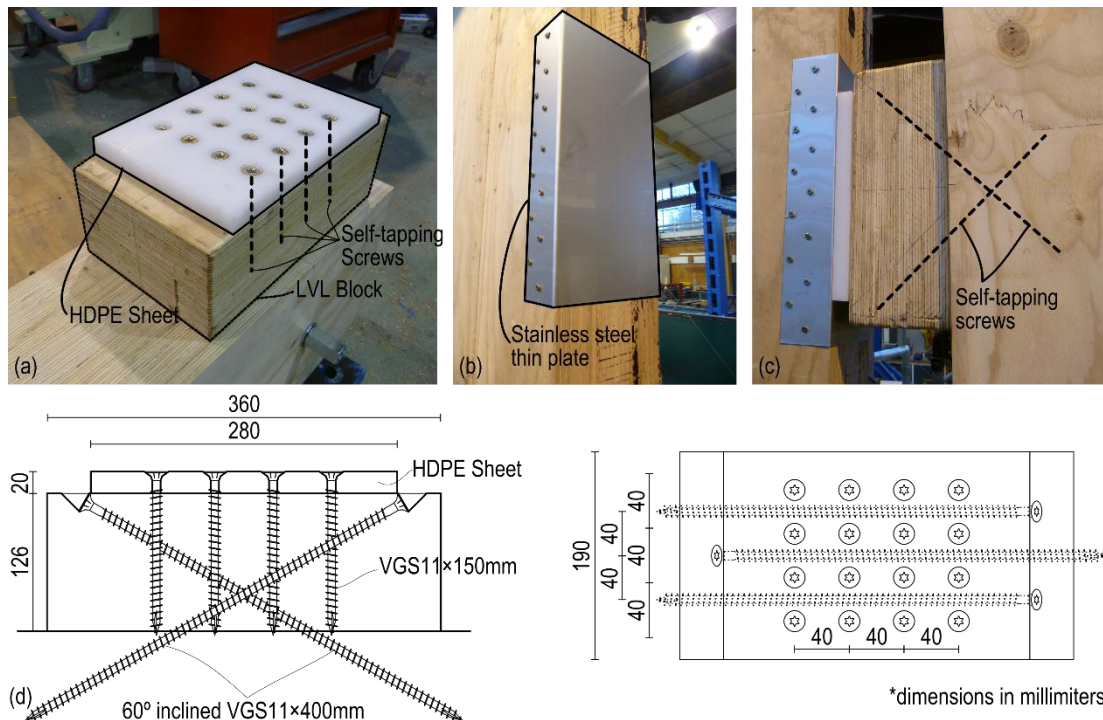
Shear transfer device. (a) LVL and HDPE block on the column; (b) Stainless steel sheet on the wall edge; (c) the finished setup; (d) screw layout details.
